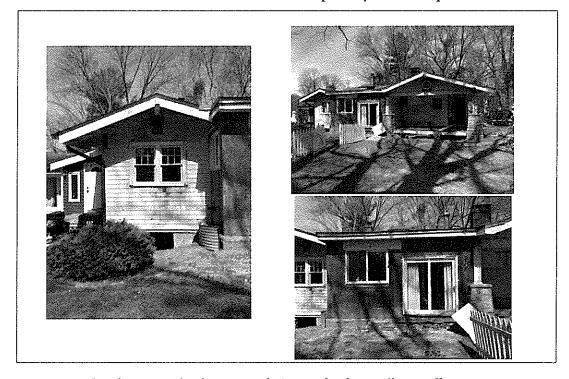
brick siding to be replaced with cedar shake, room 2 is the sun room, room 3 is the closed in porch. All brick to be removed.
